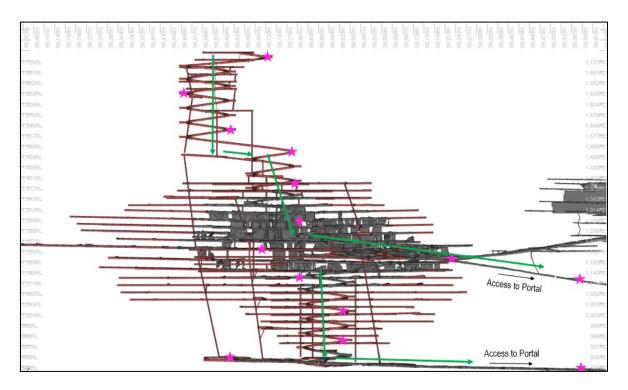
Proposed Underground Refuge Chambers (Purple) and Escapeway Route (Green arrows)
